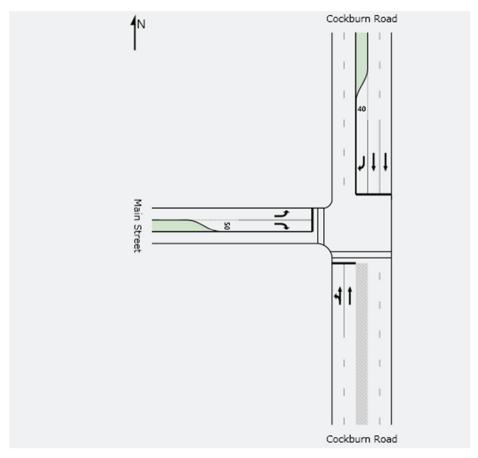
SIDRA layout for Main Street / Cockburn Road intersection
